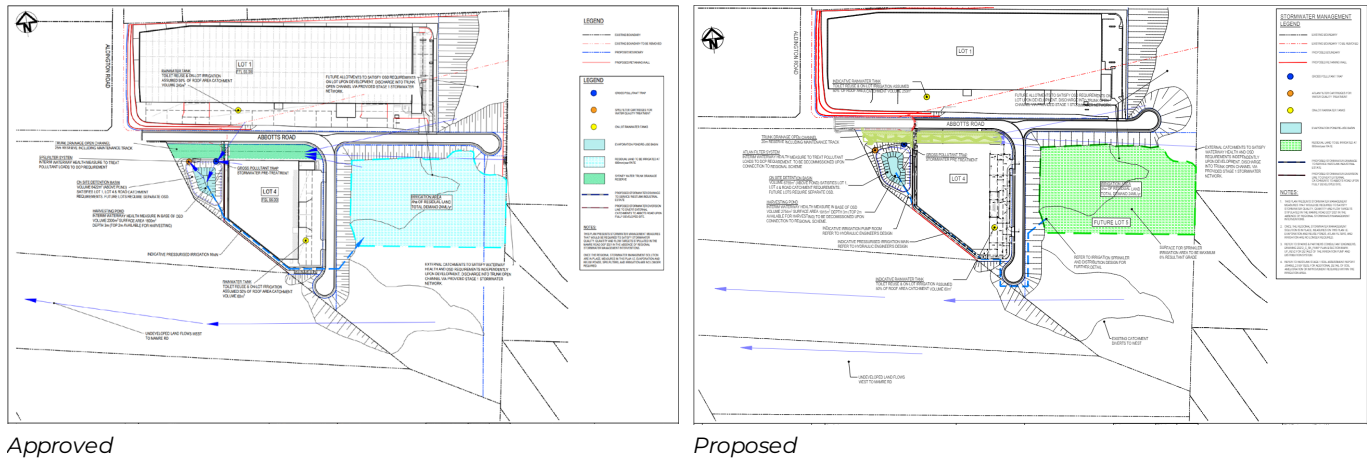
Approved and Proposed Bulk Earthworks Plan
